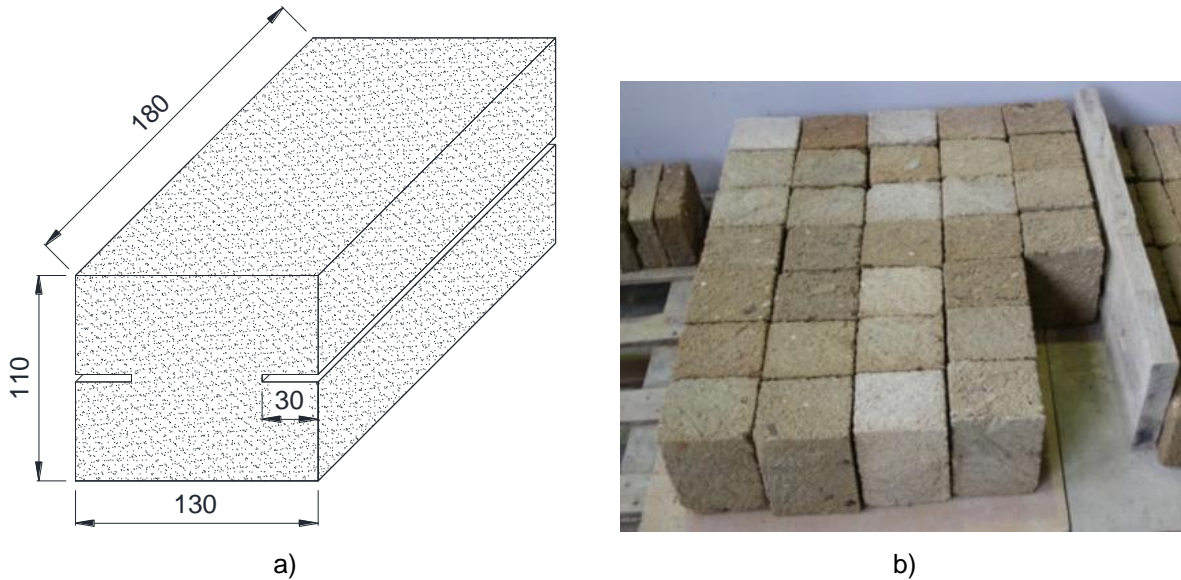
Specimens to test in shear with axial compressive load: a) dimensions of specimens (mm); specimens after preparation, without notches.
